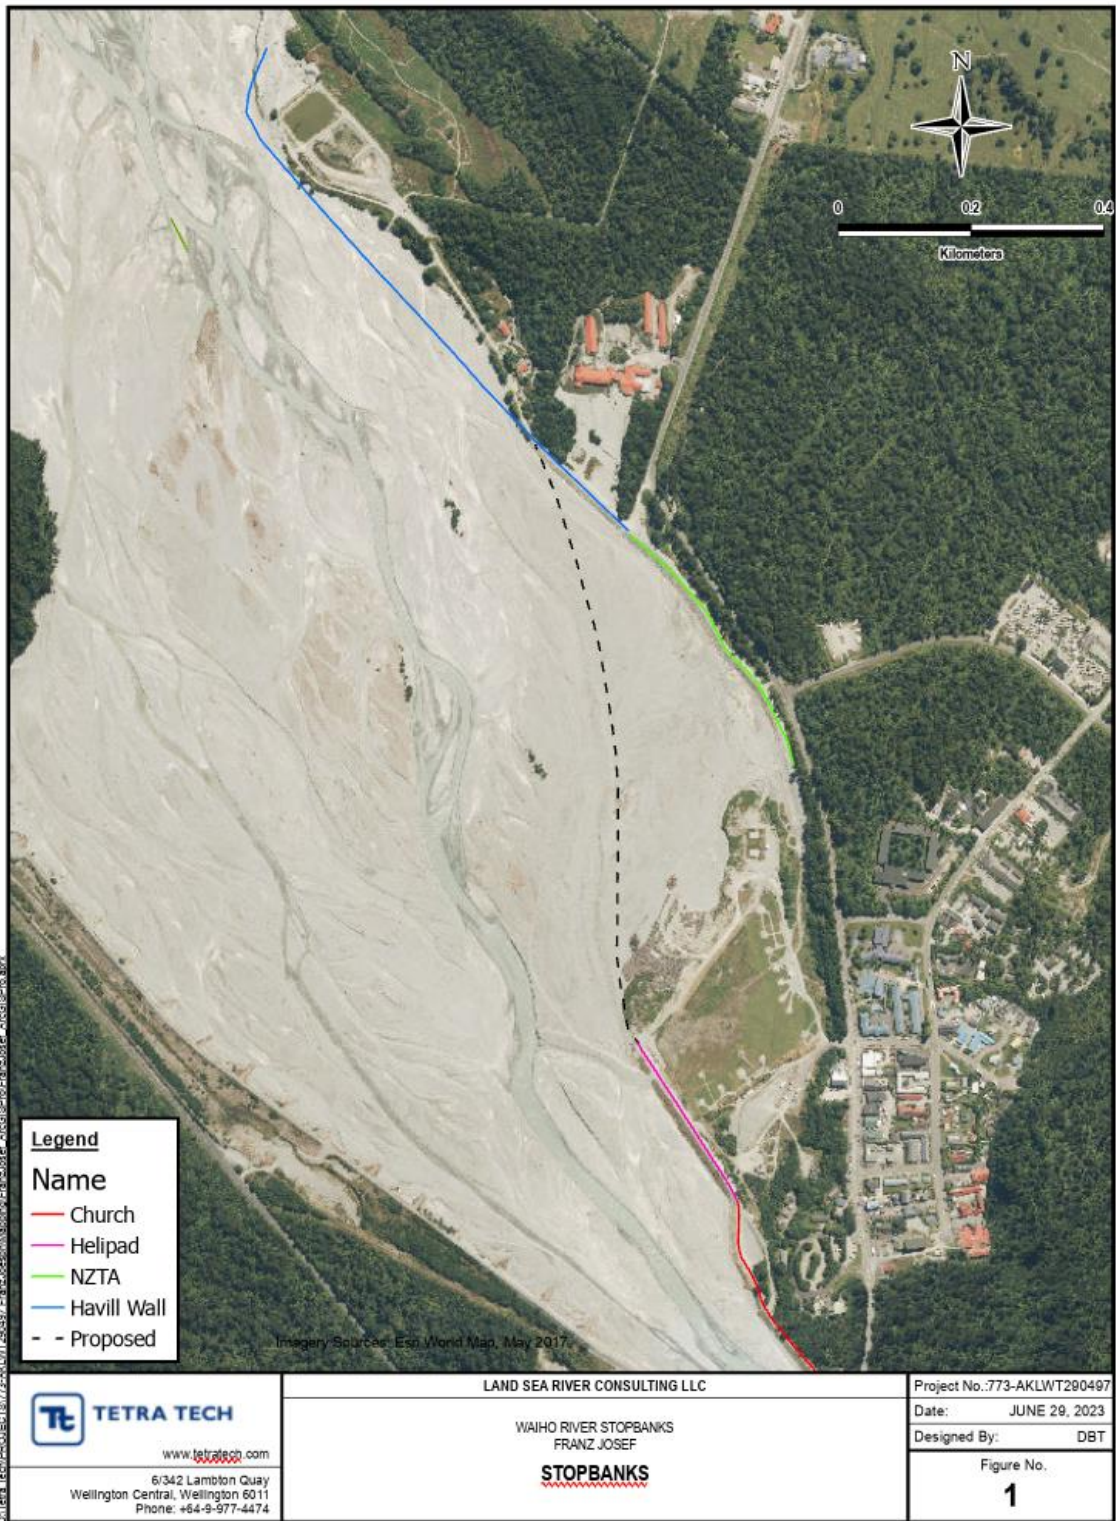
Location of the existing Church, Helipad and Havill Wall stopbanks and the Proposed stopbank.
